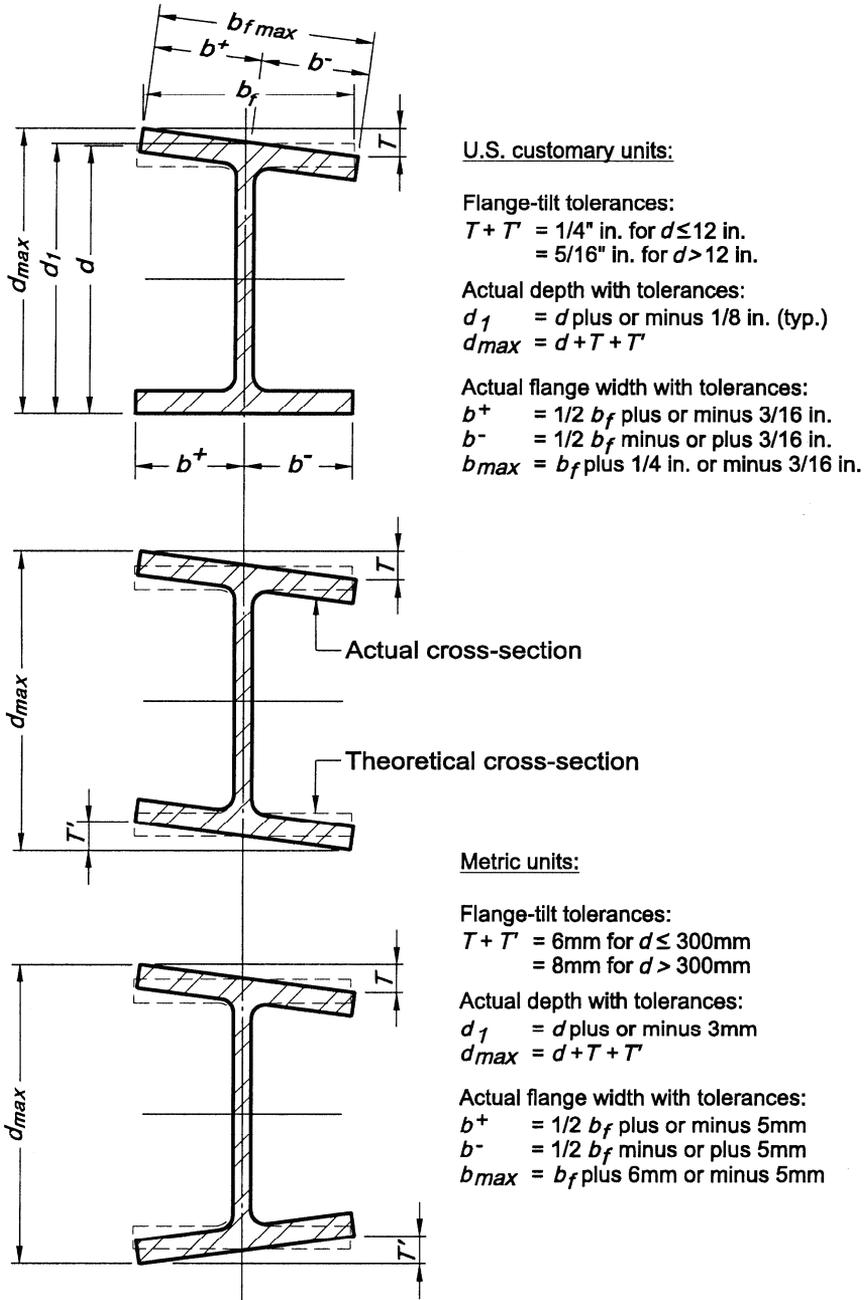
Mill tolerances on the cross-section of a W-shape.
